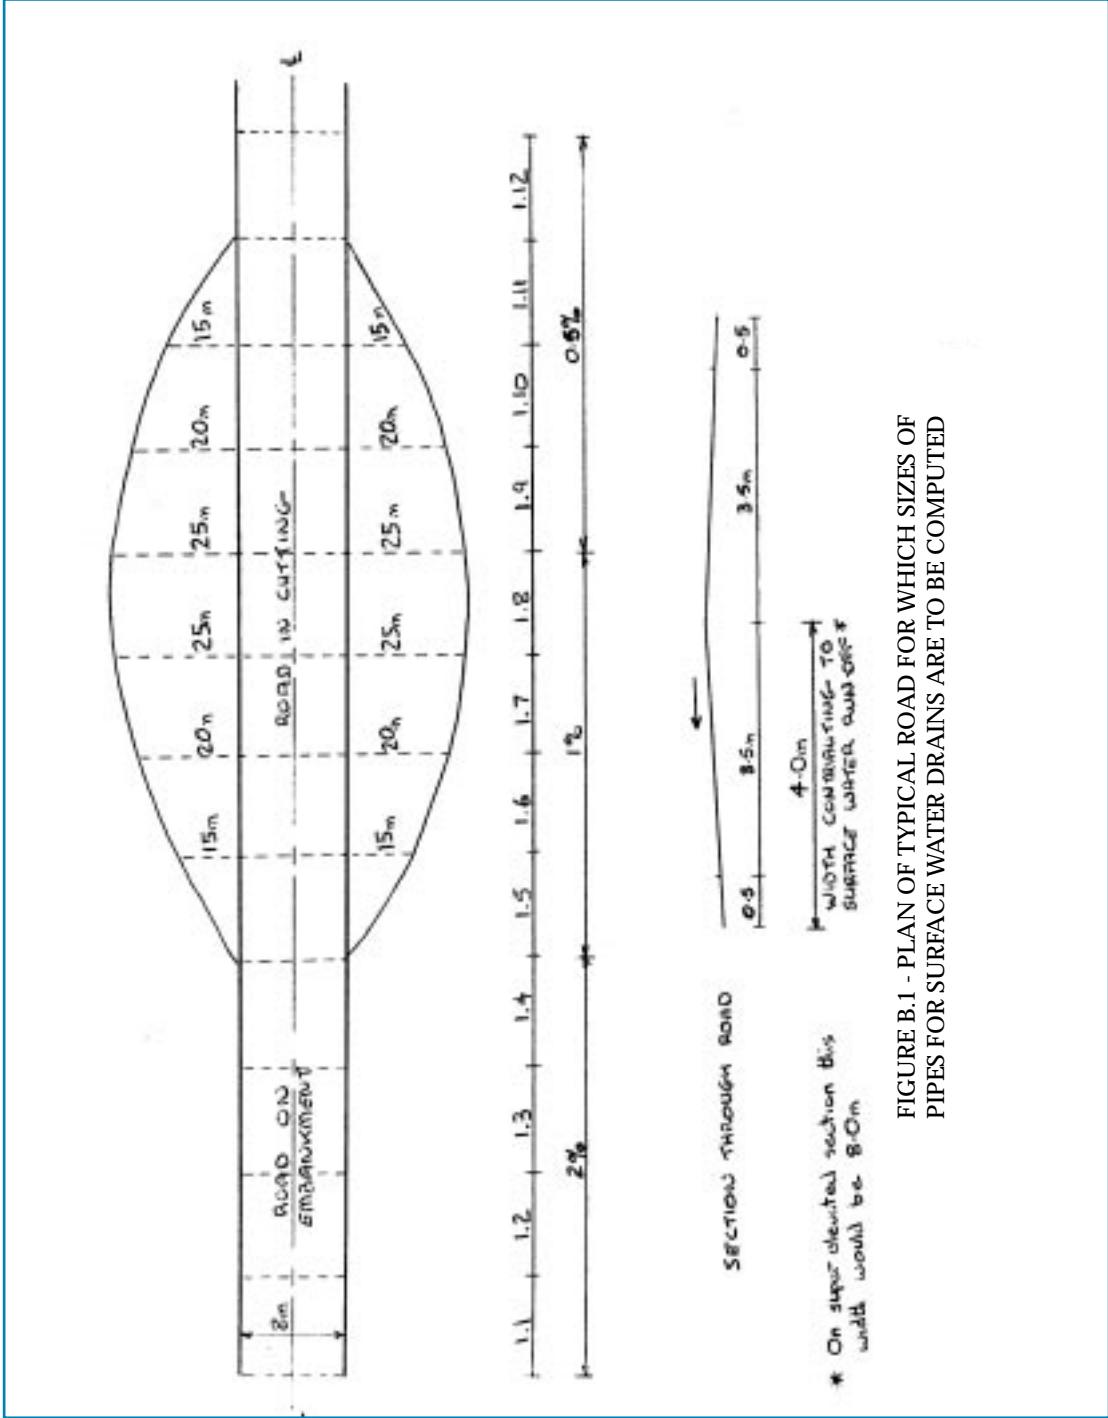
PLAN OF TYPICAL ROAD FOR WHICH SIZES OF PIPES FOR SURFACE WATER DRAINS ARE TO BE COMPUTED
